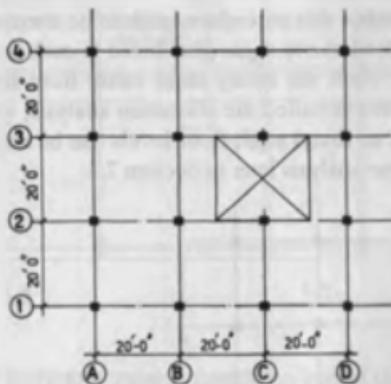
Plan and elevation of a building referred to in the illustrated example. Framing plans at levels 90'-0" to 120'-0".
